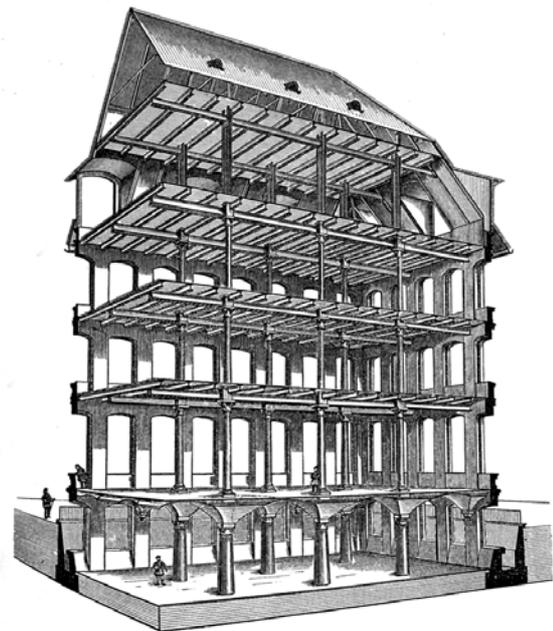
French system of I-beams with transversal members, embedded in concrete, Coignet, 1861. (Pauser, after Skempton)
